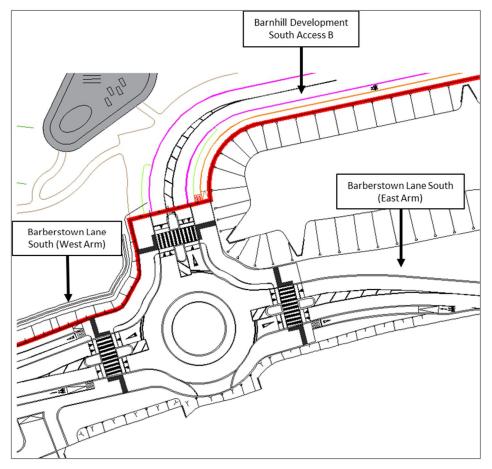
Proposed Barberstown Lane South/Barnhill Development Access B Junction Layout
